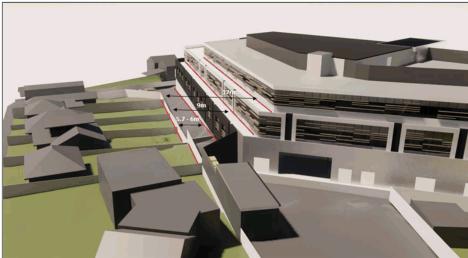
3D render and model from Seymour Street - illustrating the stepped façade of the building along the southern and western elevations (source: SPA)
